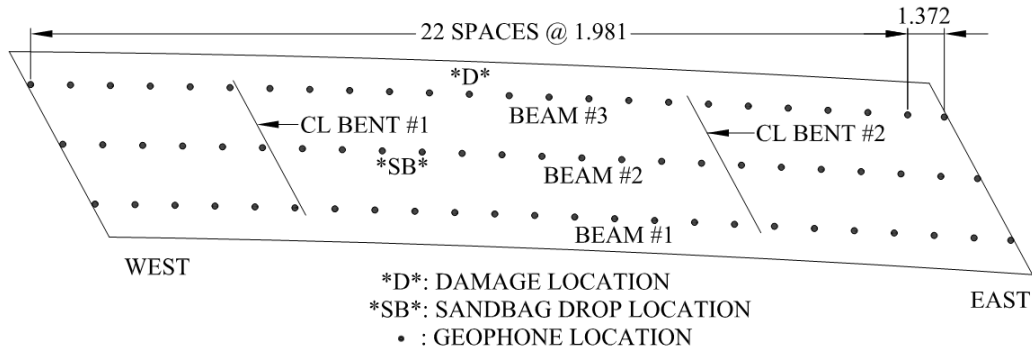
Entrance ramp to James White Parkway: geophone layout
